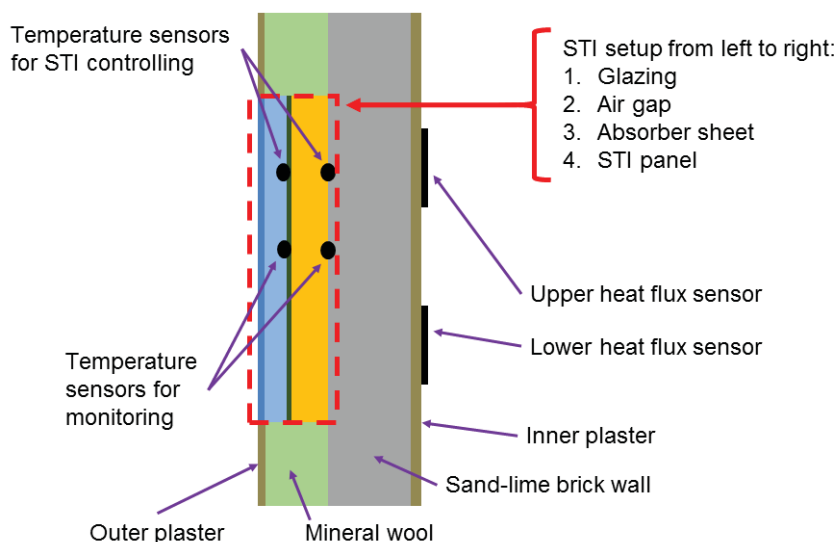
Sketched cross-section of the real STI setup with massive wall and surrounding thermal insulation and plaster.
